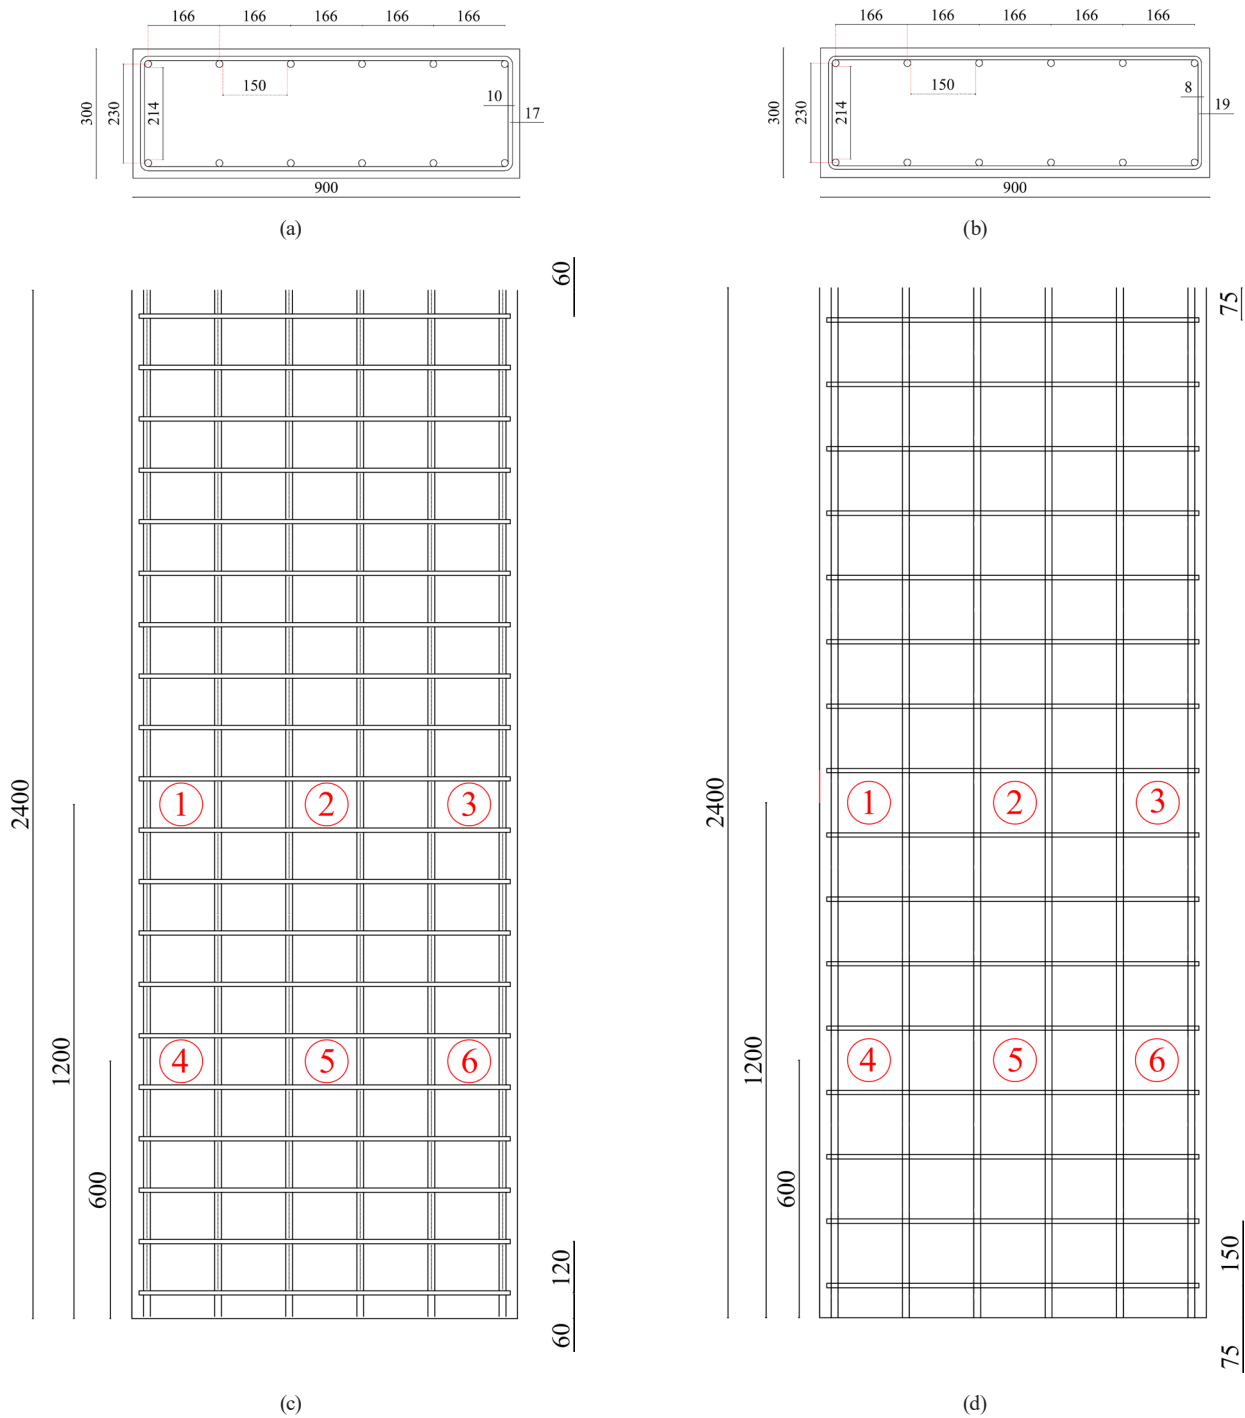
The column and considered beam dimensions and connection locations (dimensions in mm)
